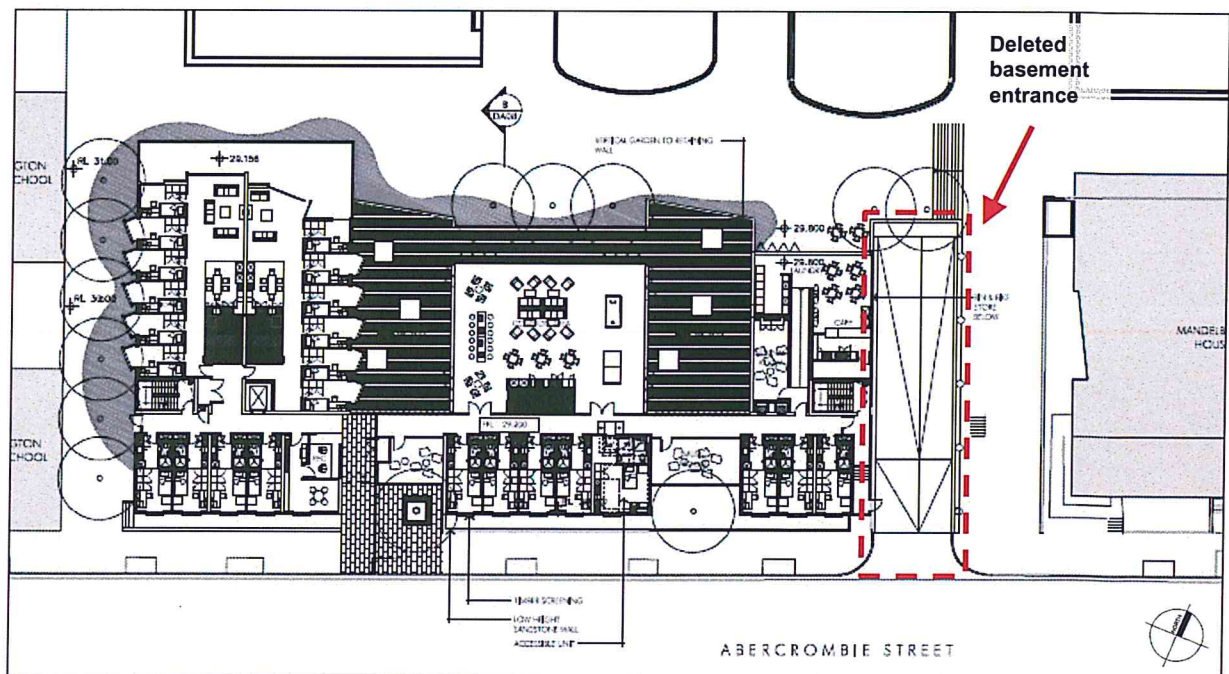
Approved Student Accommodation Building Layout (Ground Floor Plan)
